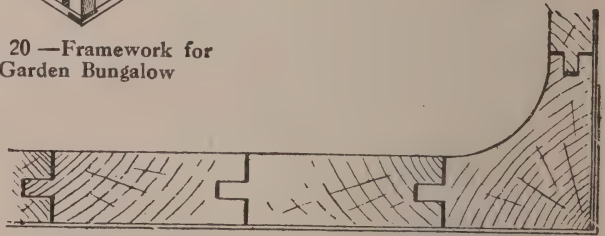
Enlarged Detail of Junction of Floor and Wall
